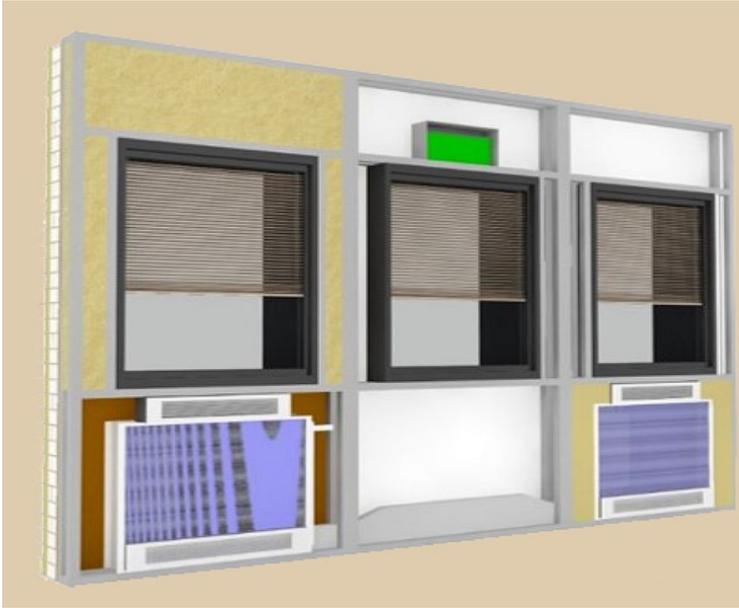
Modular system of a Smart wall (source: rehouse-project.eu)
